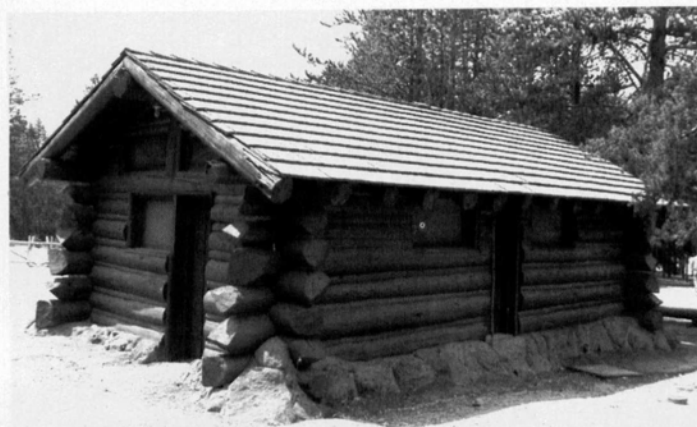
Exposed roofing members of Rustic style buildings such as this structure at Yellowstone National Park are highly susceptible to deterioration. Photo: Laura Soulliere Harrison.
